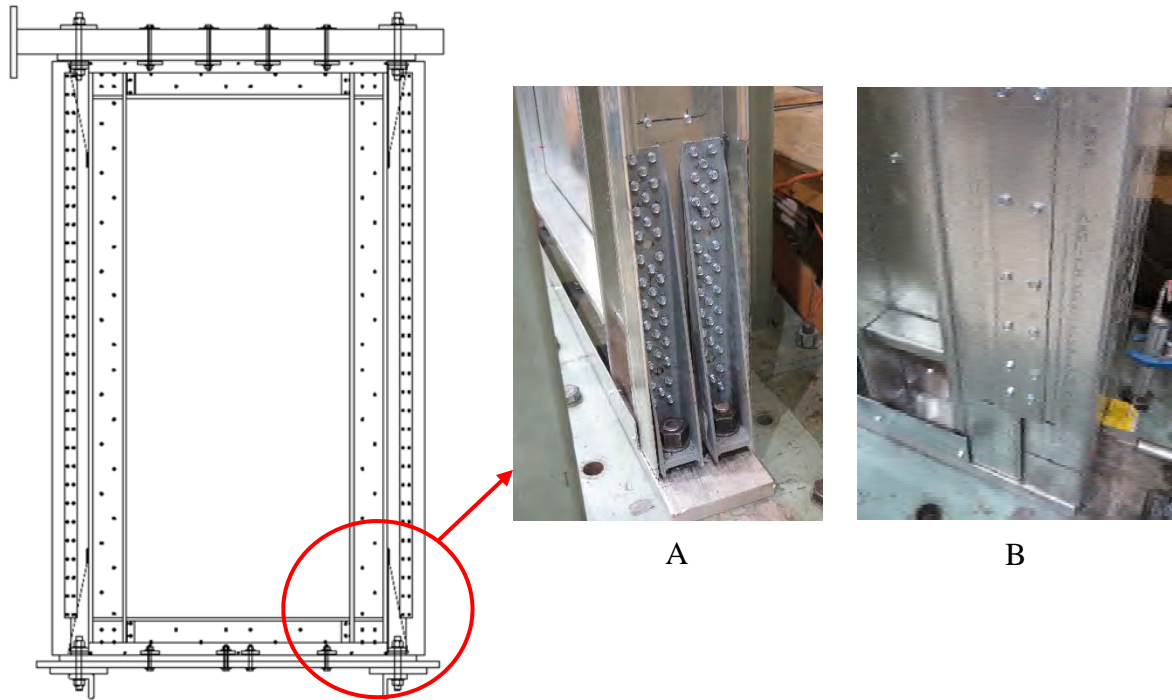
MR3 chord stud reinforcement. A) First reinforcement installed. B) Second reinforcement installed.
